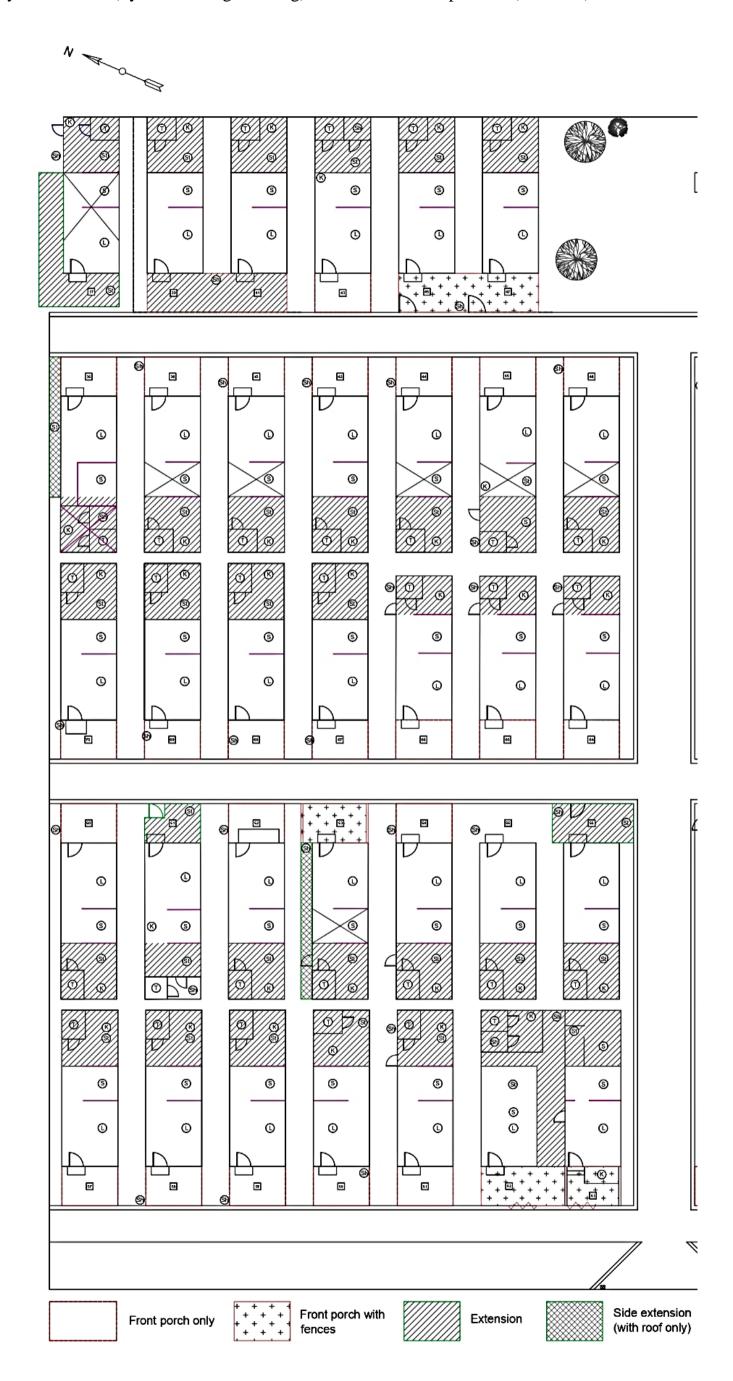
Site layout of Site 2 (Pyit Tin Taung Housing) with modification patterns (Right side)
